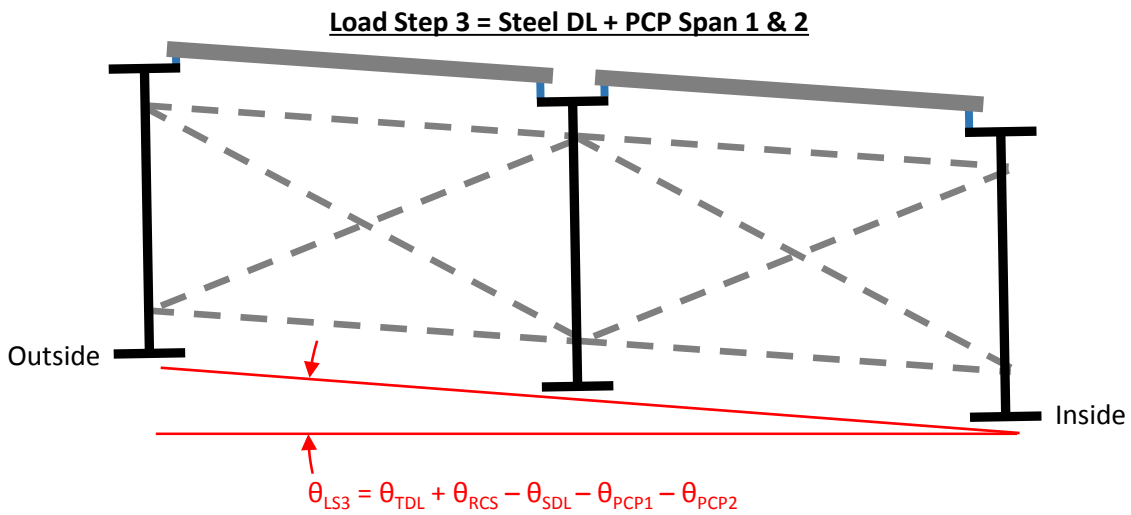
Load Step 3– Steel I-Girder System Twist SDLF – Section A-A
